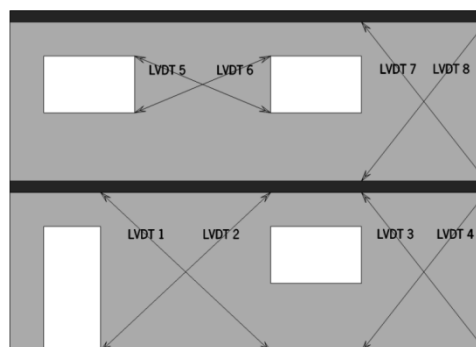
LVDTs position on asymmetric buildings at east wall
